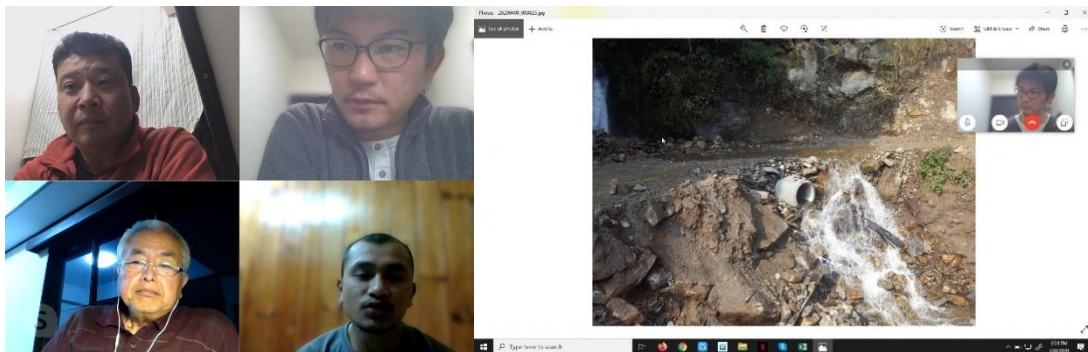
Example of checking construction progress and site status via web meeting
